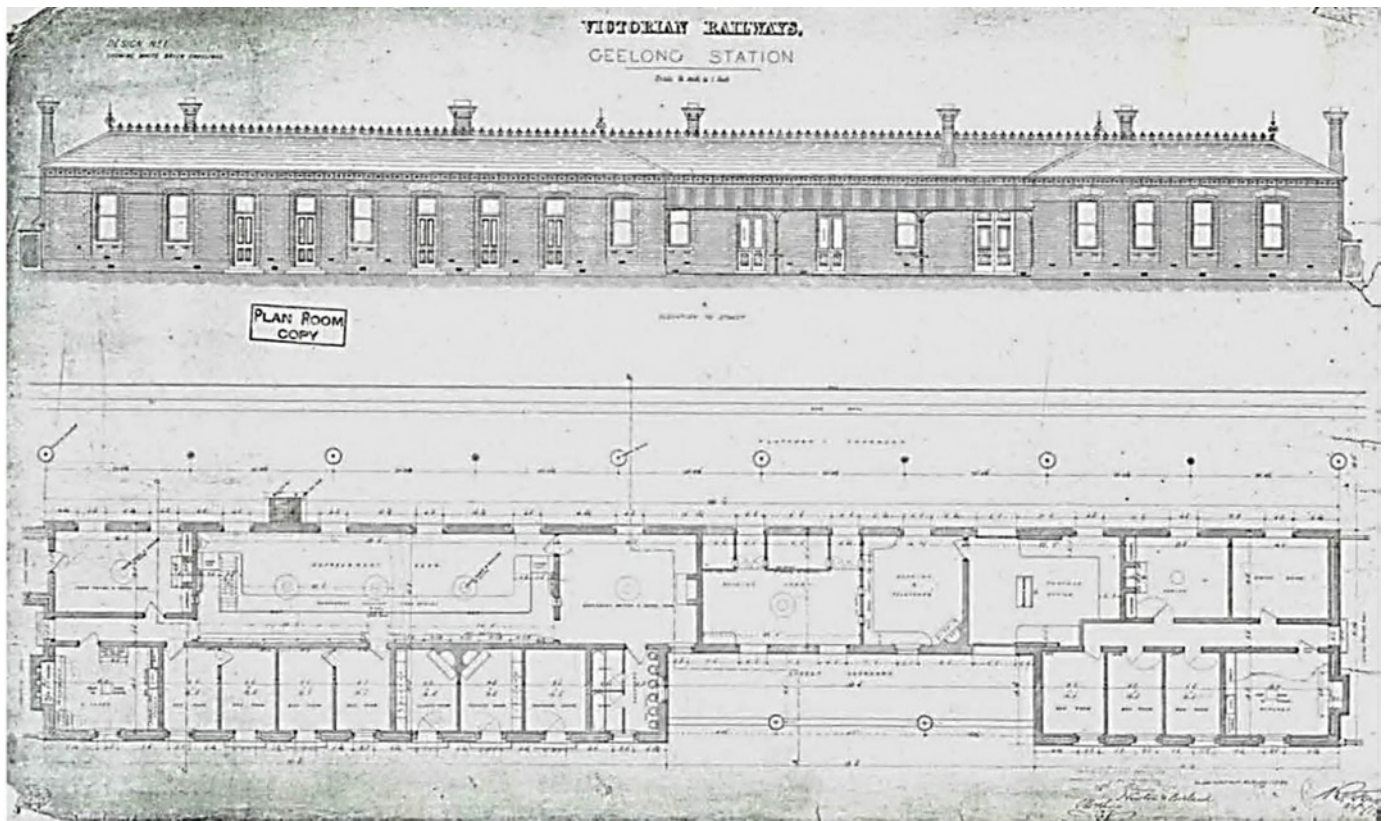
G.W. Simms, Victorian Railways Geelong Station, 'Elevation to Street & Floor Plan', 1879. Source: GRS 3133, Geelong Heritage Centre collection.
